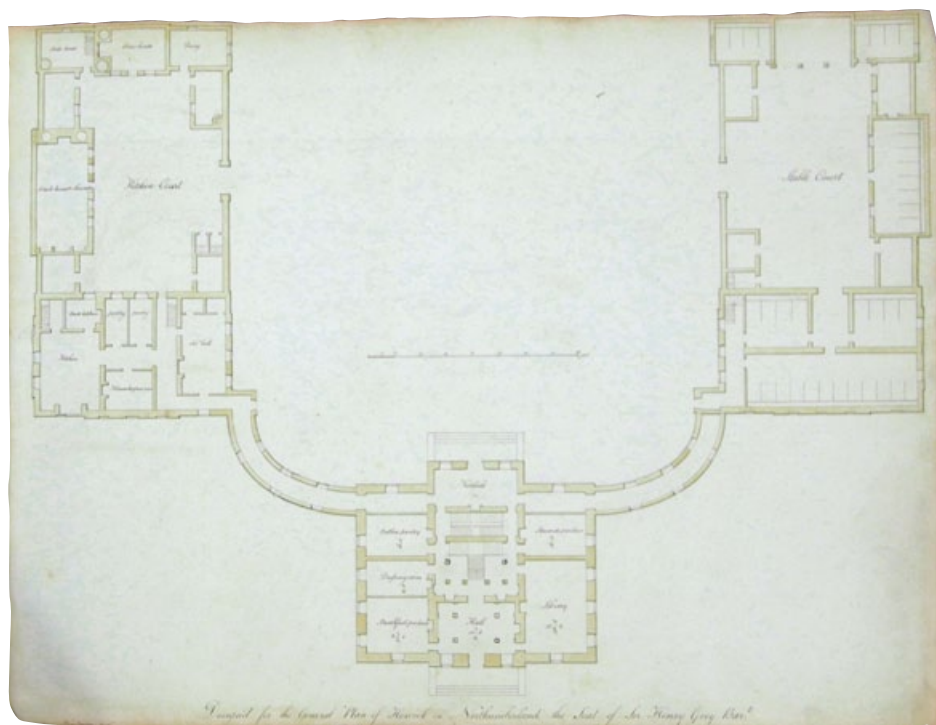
Ground floor of unbuilt plans for Howick Hall by William Newton.
